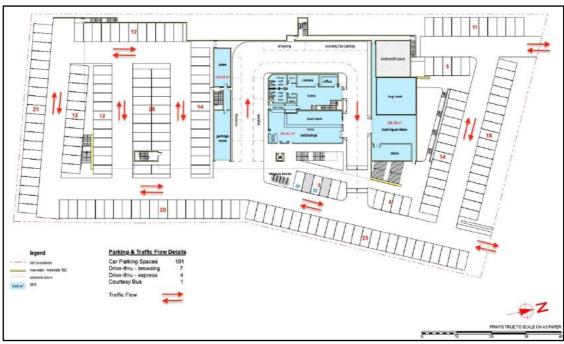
Parking & Traffic Flow Layout (Source: SP/DMD 2023)
